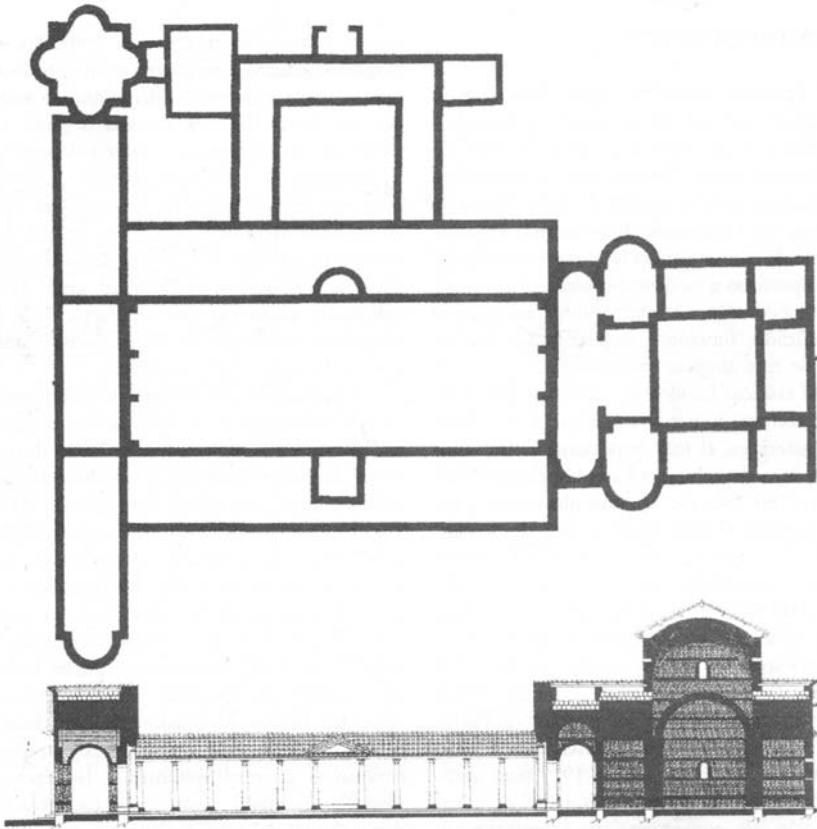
Carranque, domed structure, plan and reconstruction. Fernández-Galiano (2001), 72.
